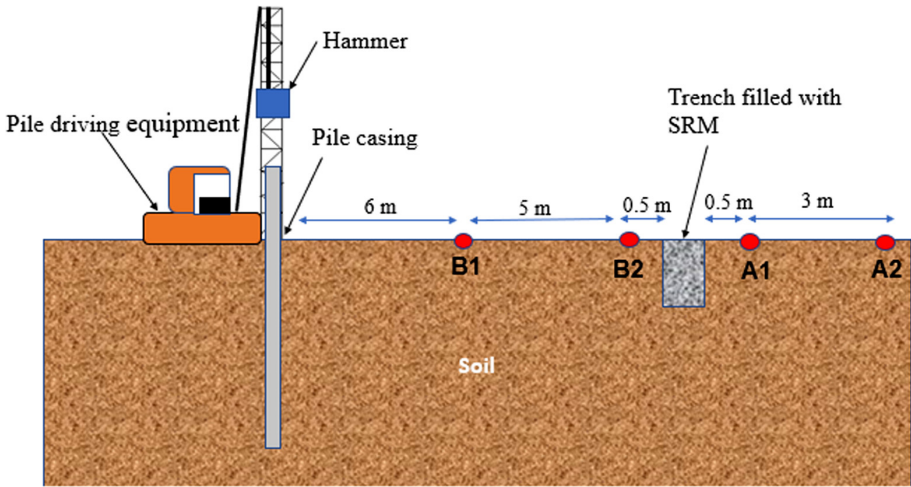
Schematic of the pile foundation installation and SRM-filled trench
